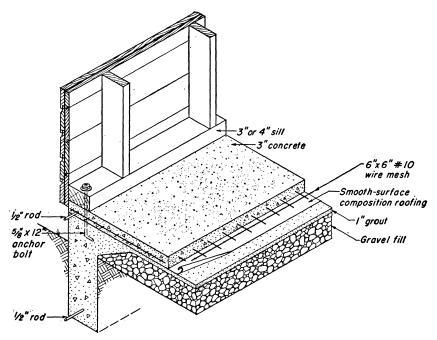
Concrete floor and foundation for wood grain bin, showing composition roofing used as moisture barrier. Note anchor bolts, reinforcing rods, and wire mesh.
